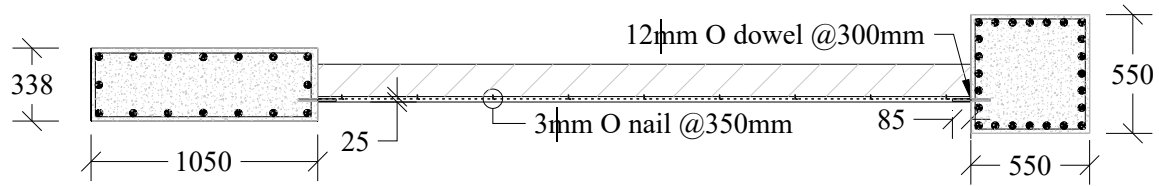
Cross section of infill panel with necessary nail and dowel connections
